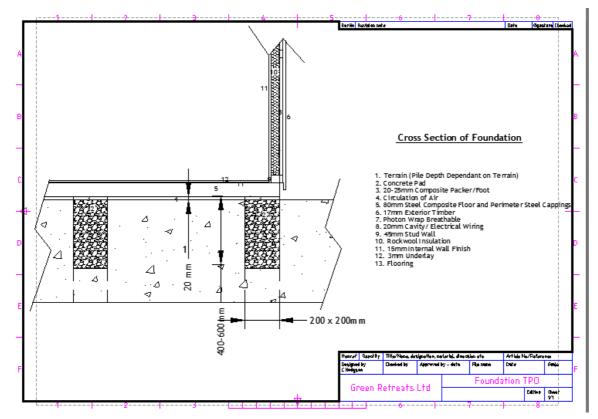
Tree pad/pile foundation details Fig 2 Standard Pad/pile Foundations Fig 3 Example of base layout
